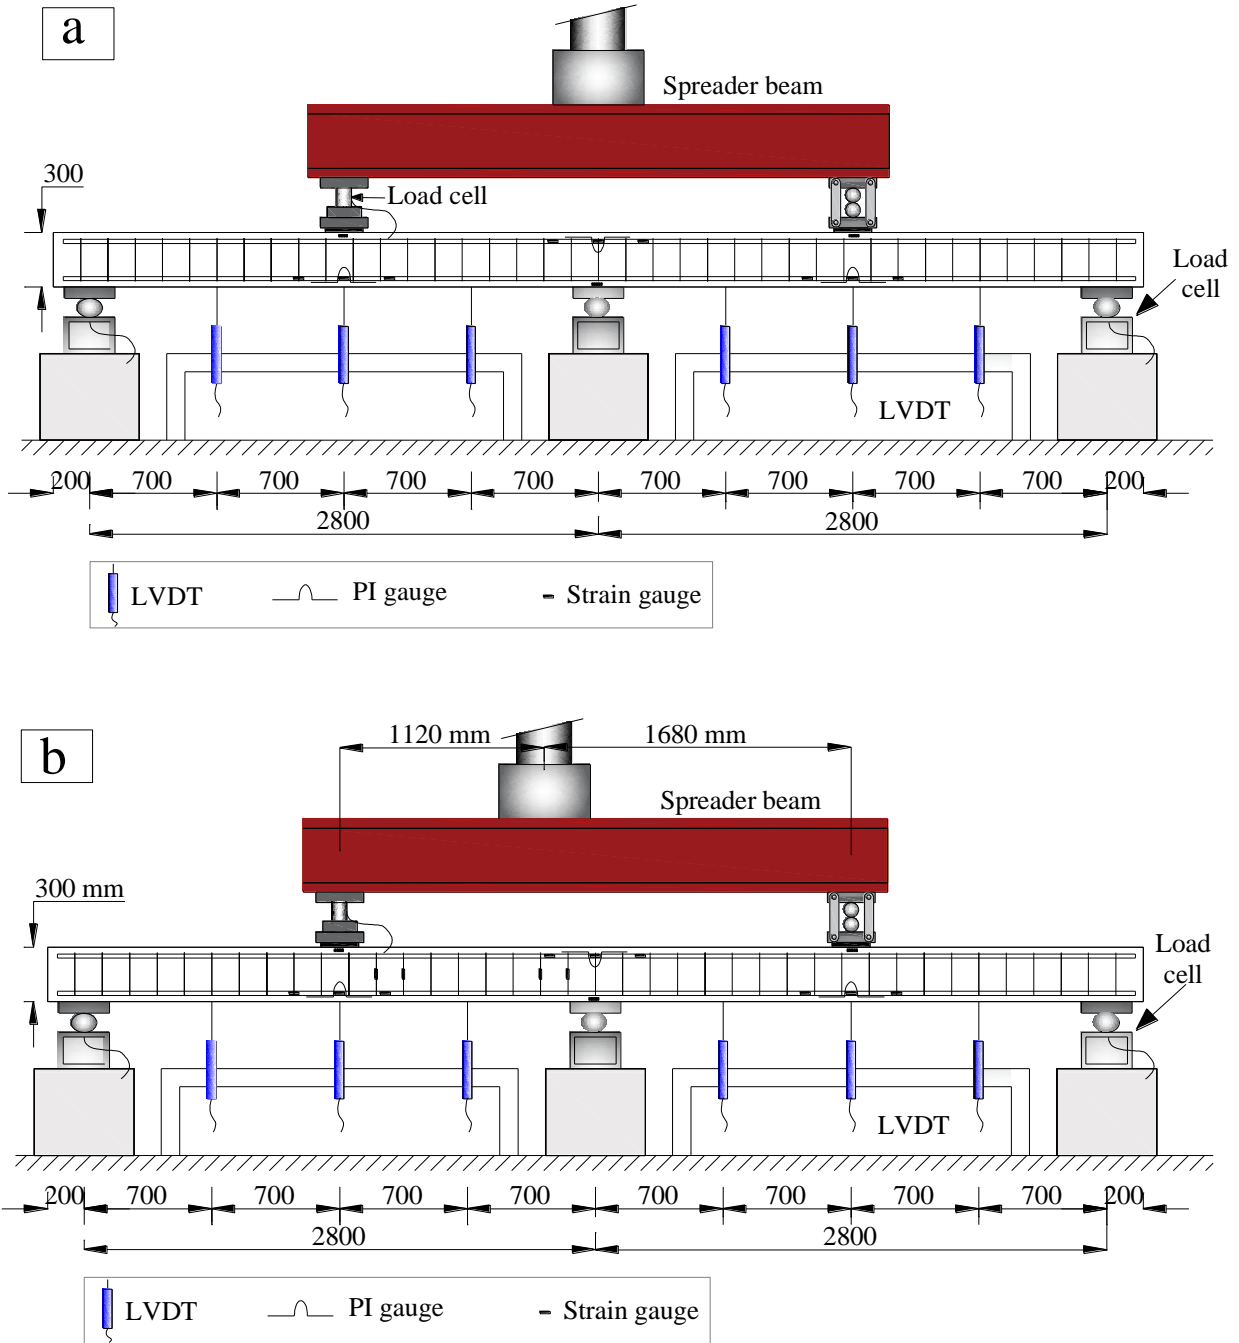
Test set up and instrumentations of the test beams in loading (a) case I, (b) case II
